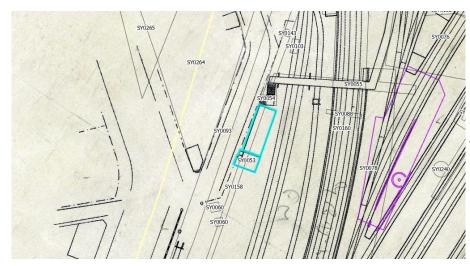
1896 plan of Sydney Yard showing the extended footbridge. Source: SLNSW, FL16812178.
